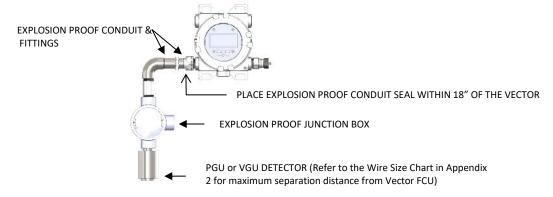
REMOTE PGU/VGU DETECTOR MOUNTING
